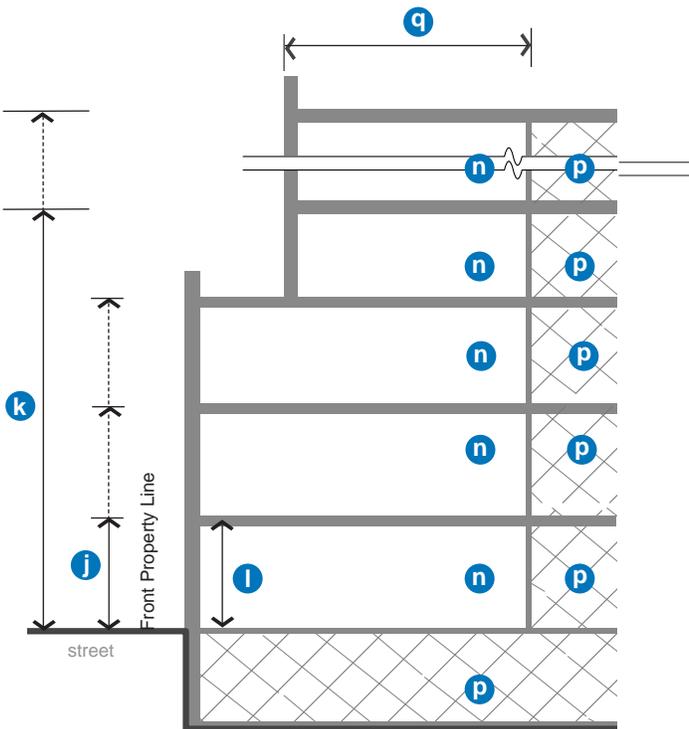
(2). General Stoop Building: Height & Use Requirements.
